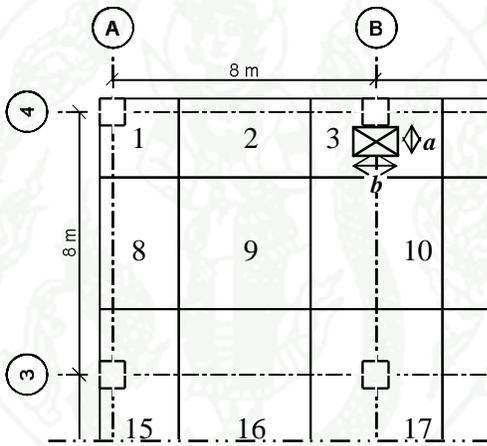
Flat plate model with opening at the face of edge column [O-9]
